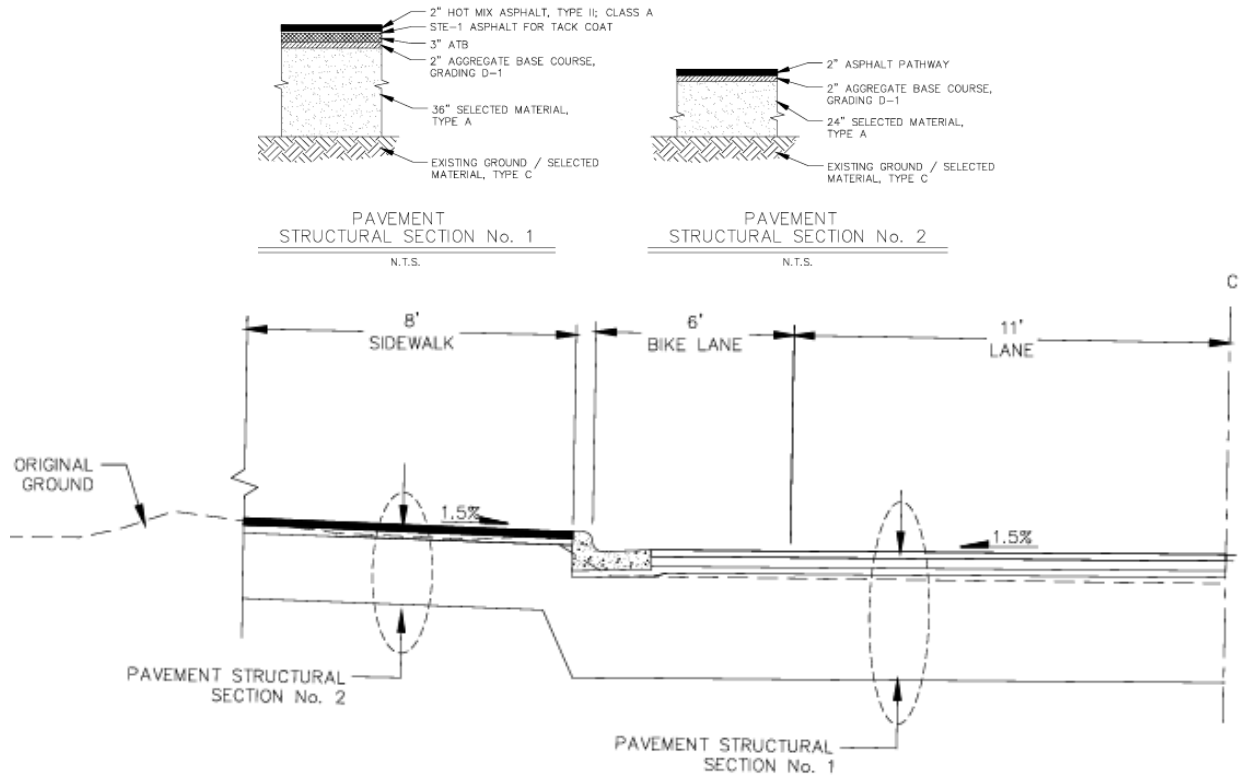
Separated Bike Lane with Sidewalk Typical Section/ Structural Section
